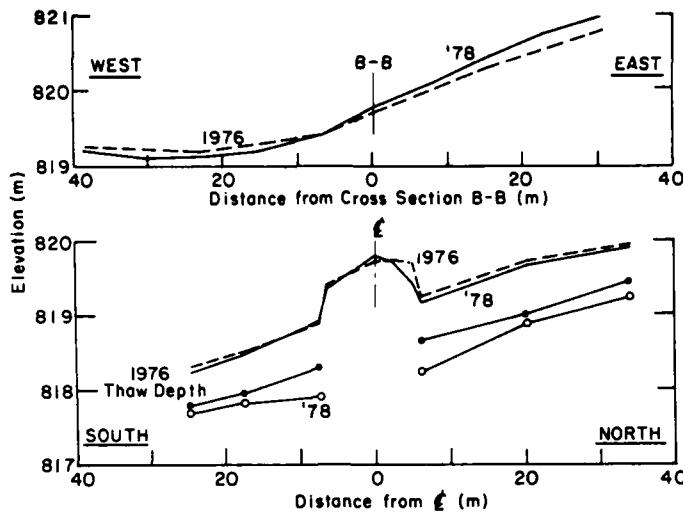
Surface elevations, Access Road 114-APL-3. The upper graph shows the centerline profile (Section C-C); the lower graph shows the elevations on cross section B-B.
